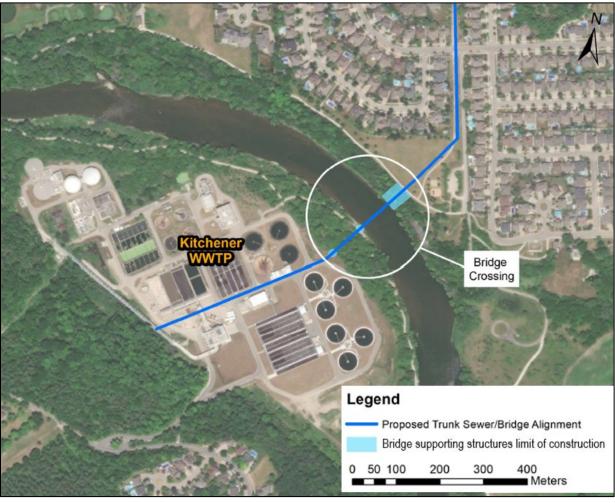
Alignment of proposed bridge showing limits of construction for bridge supporting structures (R.V.A.). Additional bridge piers will be located within the Kitchener W.W.T.P. site, but those are not within the scope of this H.I.A.
